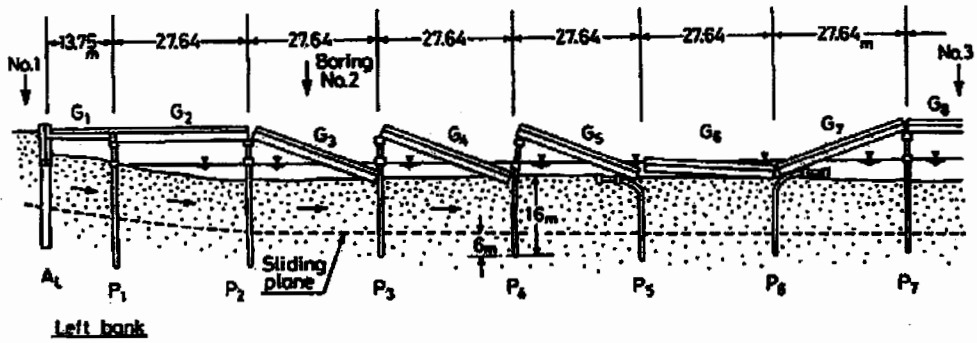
Schematic diagram of the fall-off of the girders in Showa Bridge (Takata et al., 1965)
